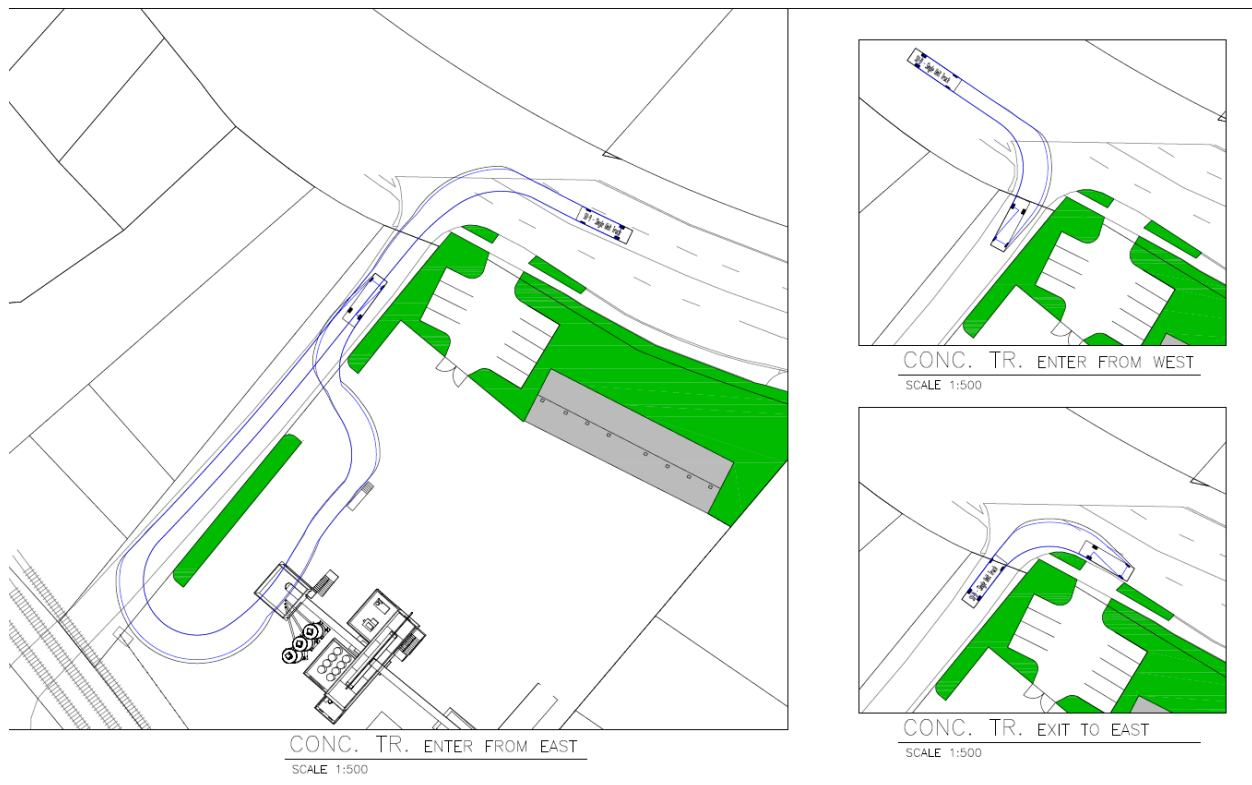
Truck Turning and Site Circulation for a Concrete Truck
